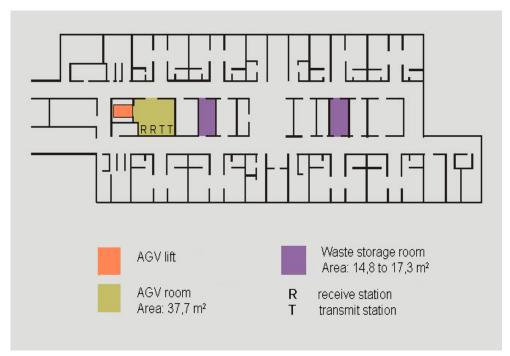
Floor plan including waste storage room, the lift and the AGV room
